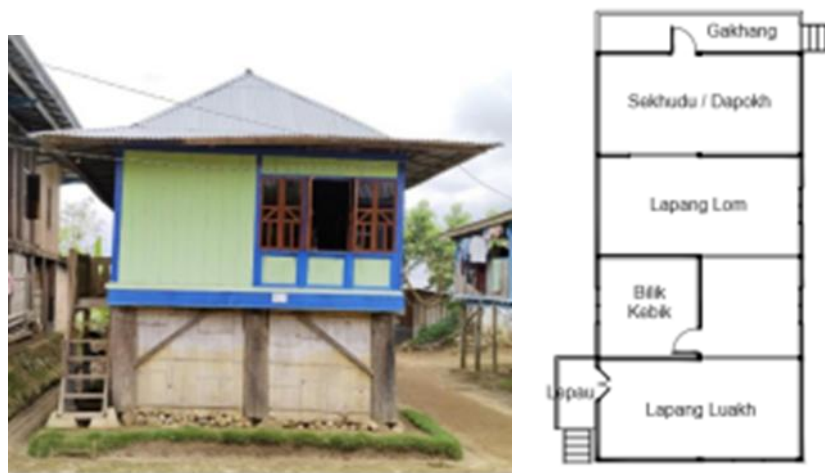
Fasade and Plan of Lamban Balakh in Pekon Hujung
